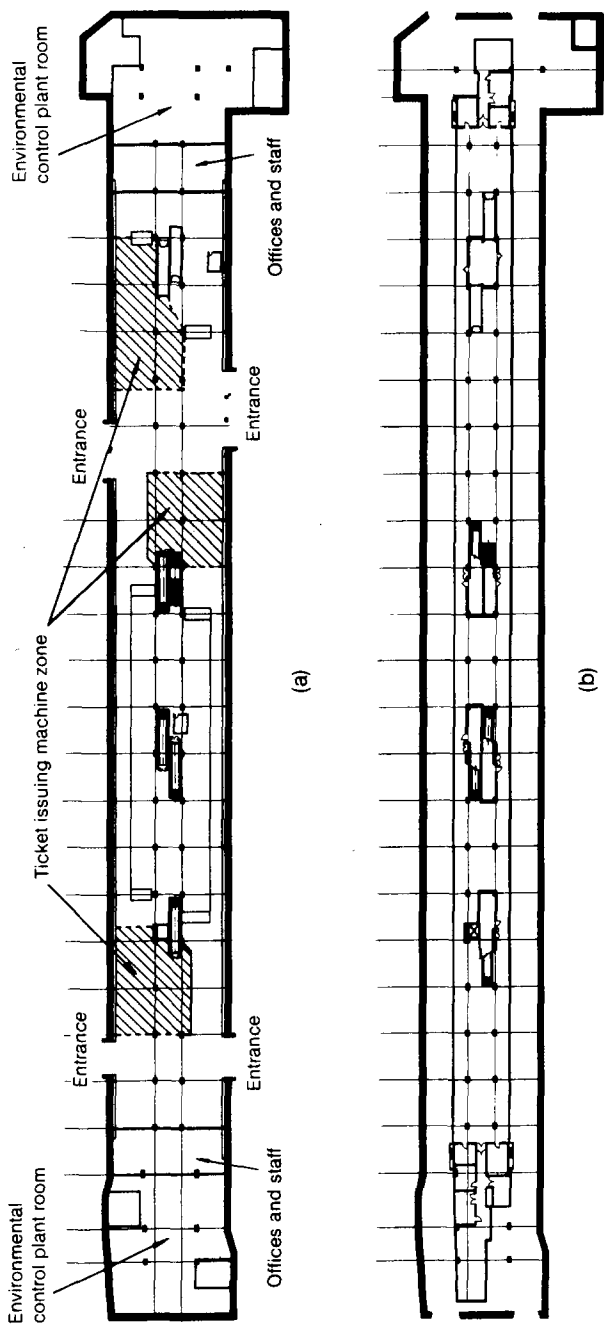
Plans of typical station: (a) concourse level; (b) platform level
